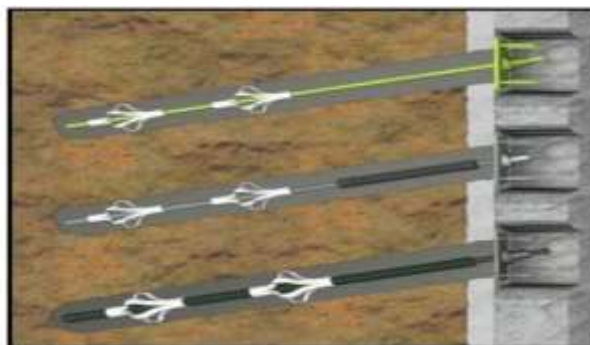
Image showing cross-section of grouted soil nailed wall
